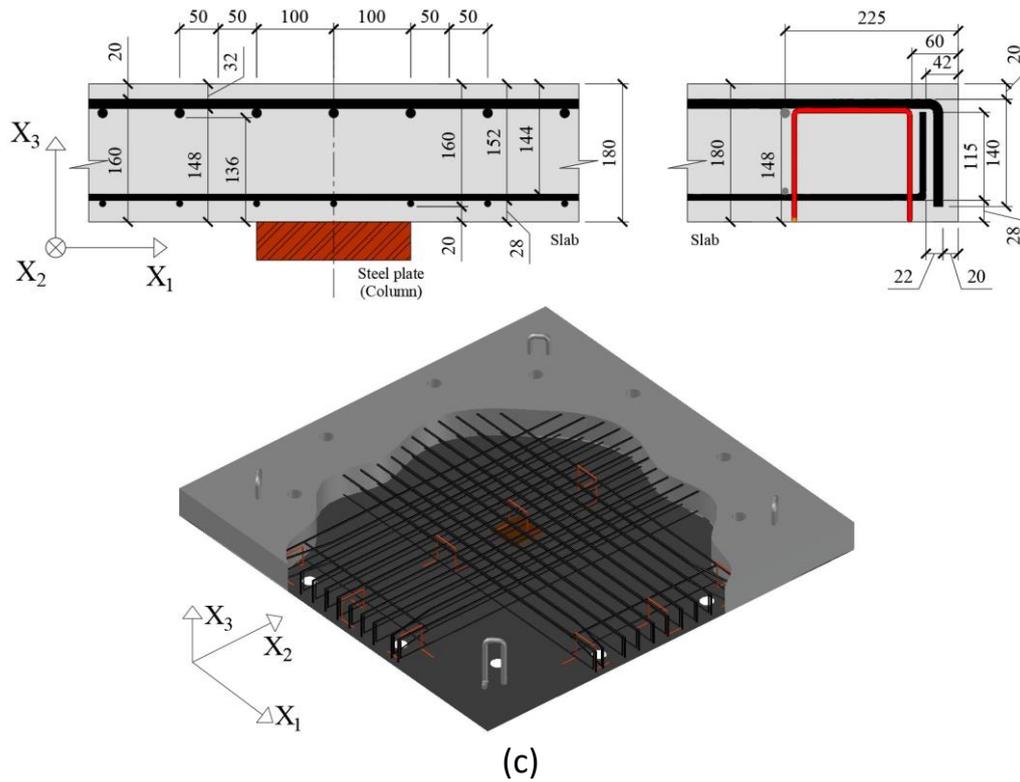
(a) Geometry of the R/SFRC slab: cross-section (b) localization of the conventional reinforcement (c) details of the conventional reinforcement (dimensions in mm).
